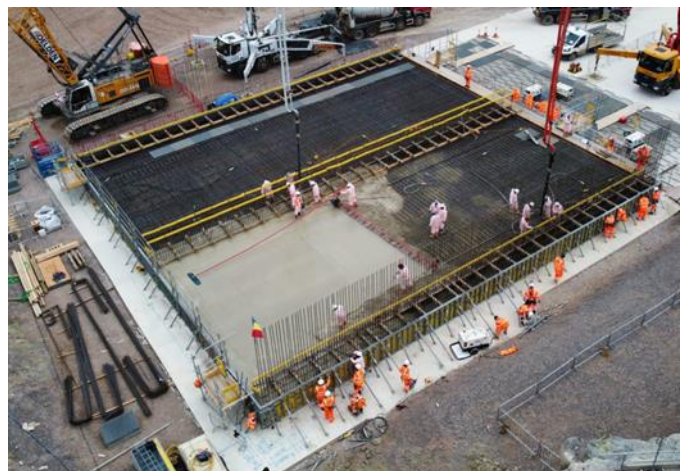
; Concrete foundations progressing at a good pace at SCL/13 green overbridge.
